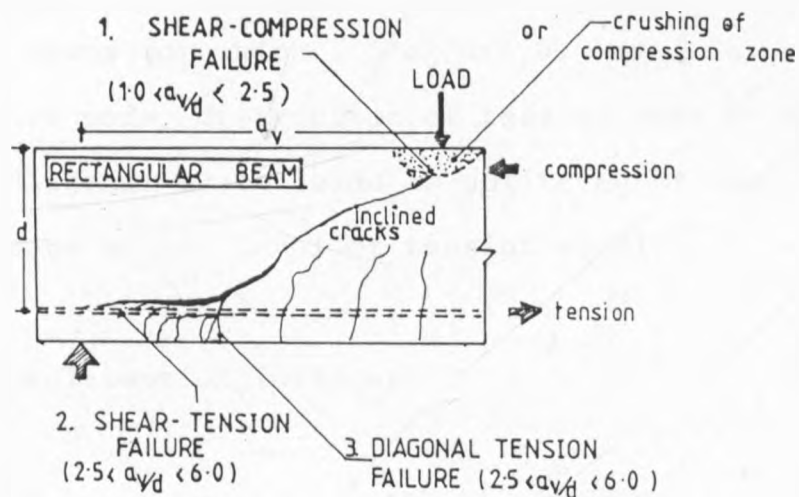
POSSIBLE MODES OF SHEAR FAILURE IN BEAMS WITHOUT WEB REINFORCEMENT
